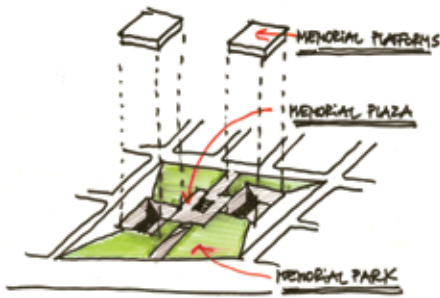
World Cultural Center site plan (Source: Rafael Viñoly Architects)
